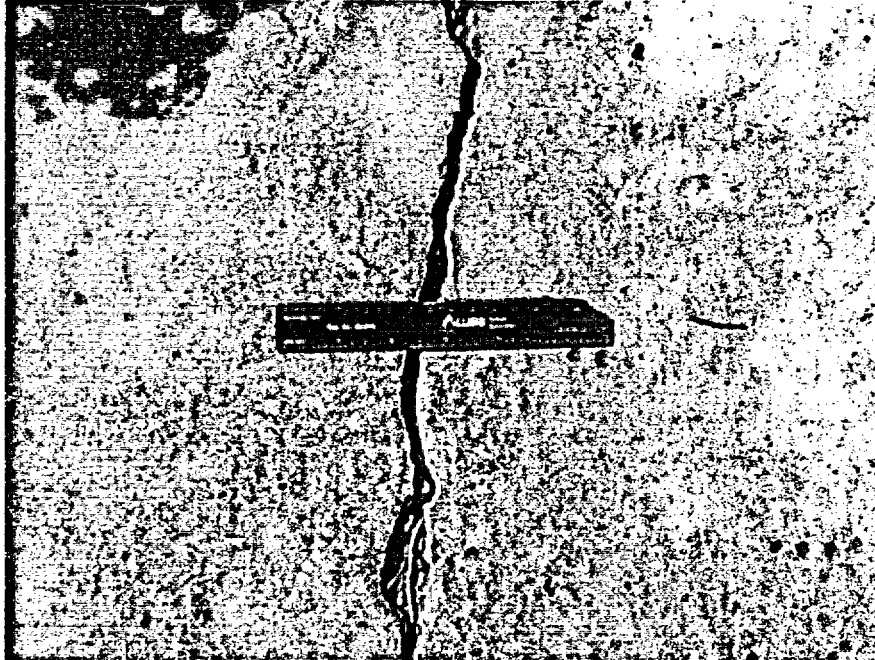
View of concrete porch apron at house wall juncture on front side (i. e., south) of house
